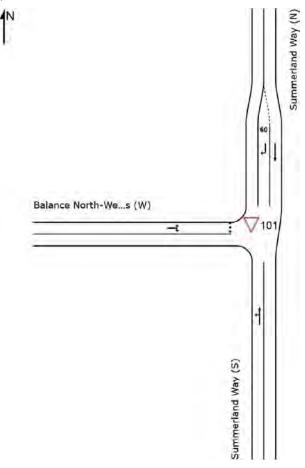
SIDRA Intersection Layout of Summerland Way / North Site Access (Intersection 1)
